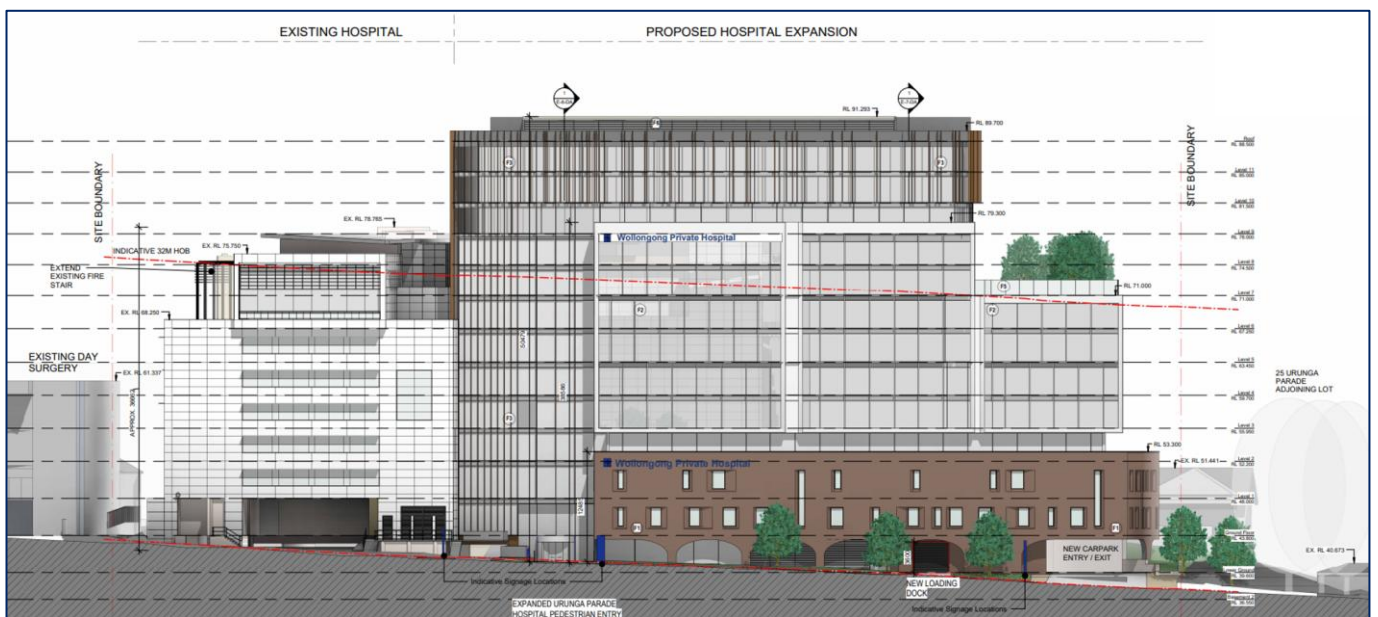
| North elevation showing proposed expansion (right) and existing hospital (left) (Source: Architectural Plans)
